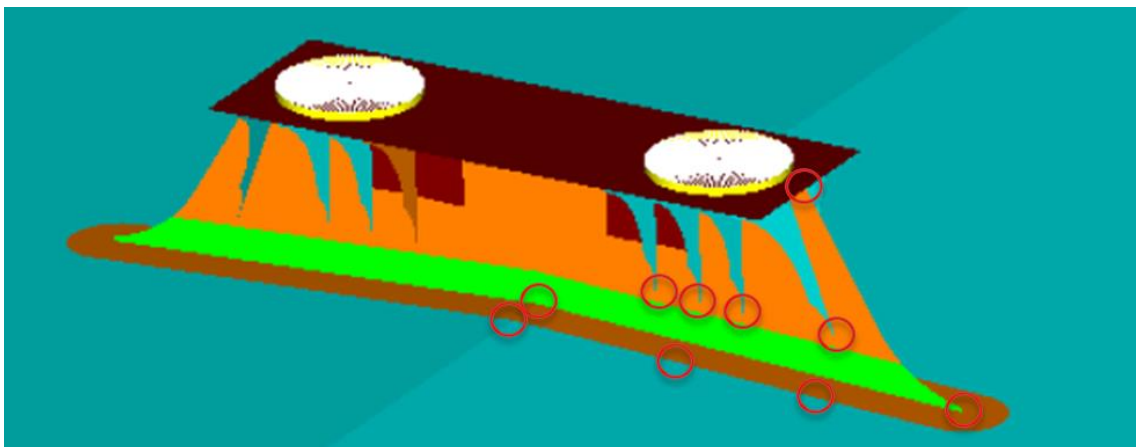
Flexible topside support 3D view. Topside support is welded to the insert plate on the deck. SB side hot spot locations presented with the red circles.
